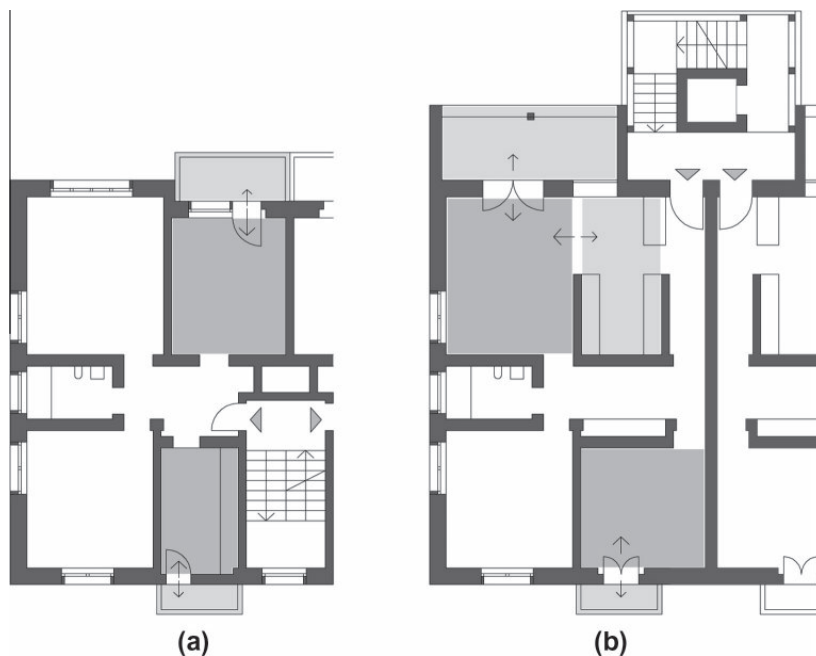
Plans of the first floor before (a) and after (b) the dwelling renovation. Subordinated relationship of spaces. Residential building, Chur, Switzerland. © [Detail]. Reproduced by permission of detail.
